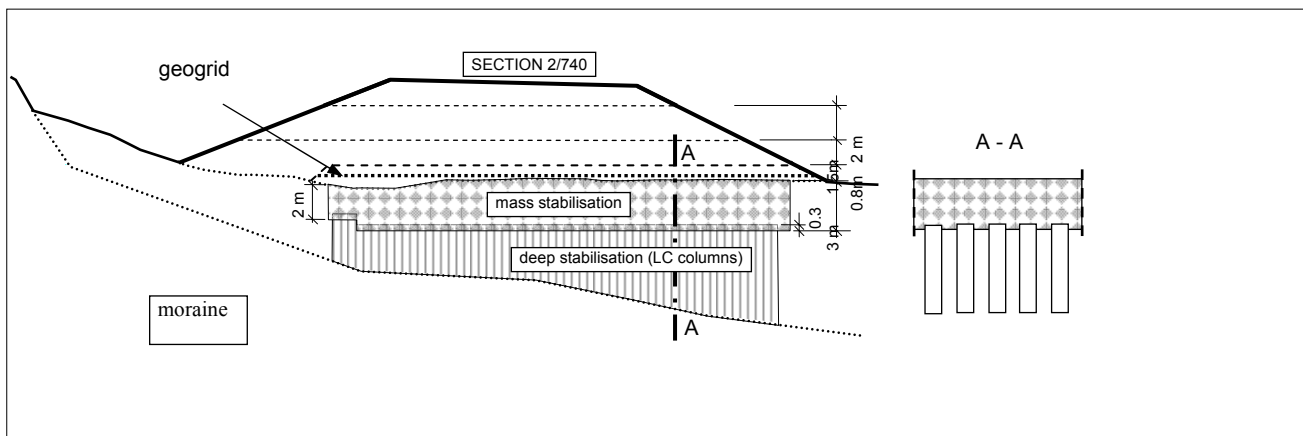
Cross section of a road embankment stabilised with DDM and mass mixing (Moraberg, Sweden, 2004).
